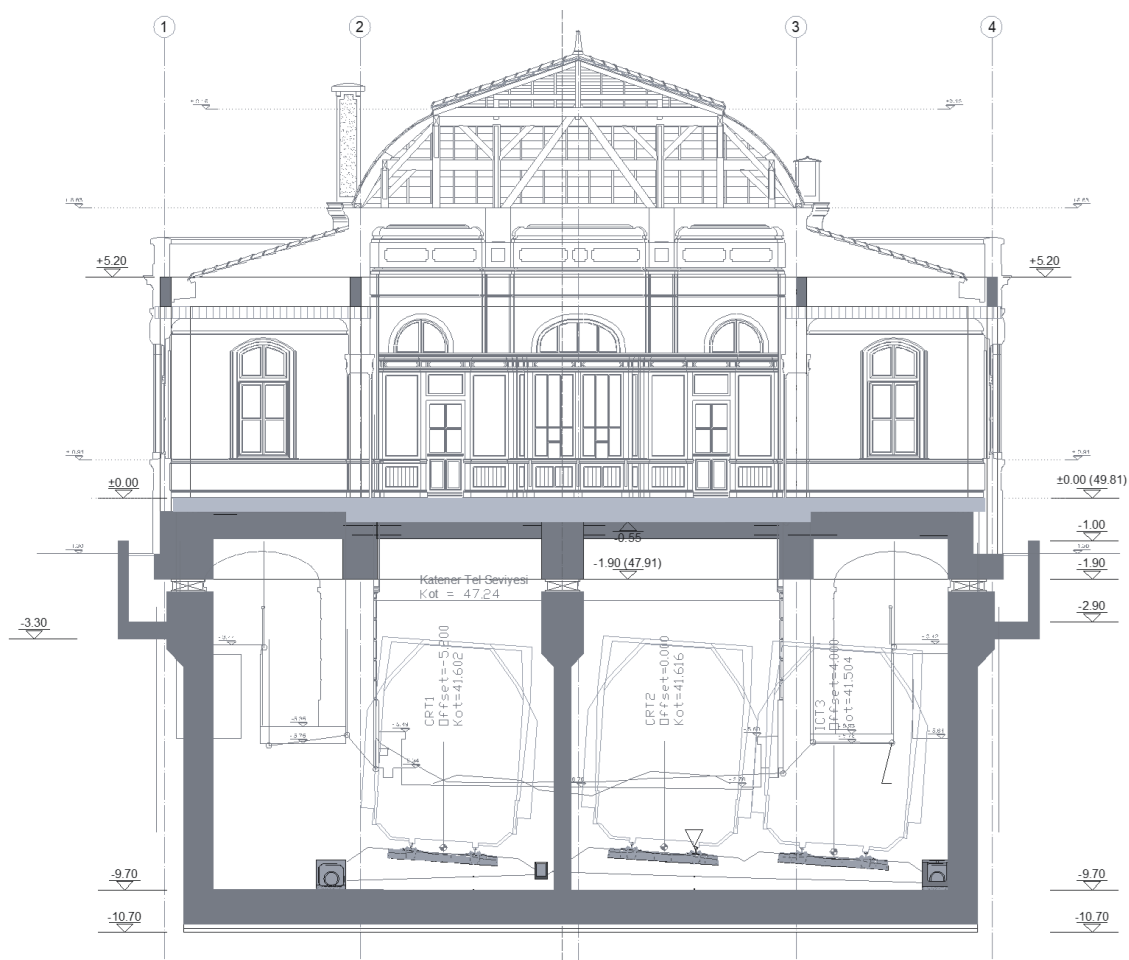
The targeted state of the structure after strengthening (Elevation from Gebze direction).
